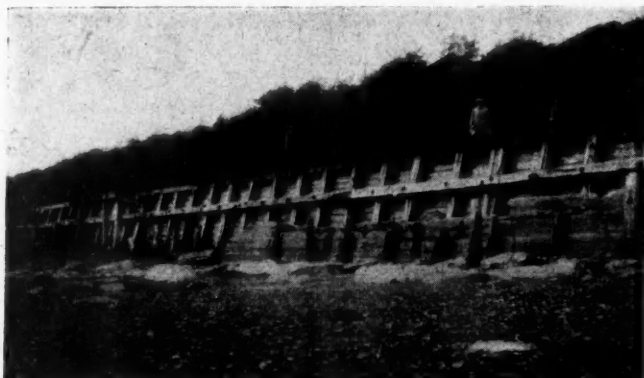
Timber Sea Wall showing the remains of a Mass Concrete Wall in the foreground.
